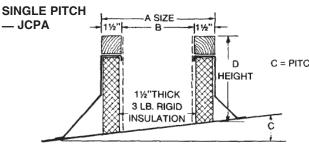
Prefabricated (Single Pitched) construction thru 9" rise per foot.
